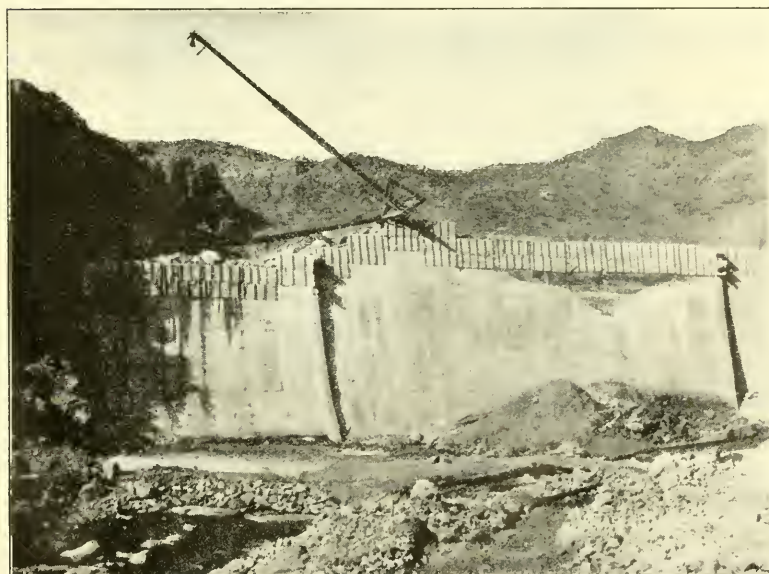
DOWN-STREAM FACE, SHOWING SPILLWAY.
